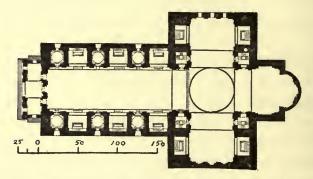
Mantua, Italy: Church of S. Andrea. About 1475 A.D. Plan.
